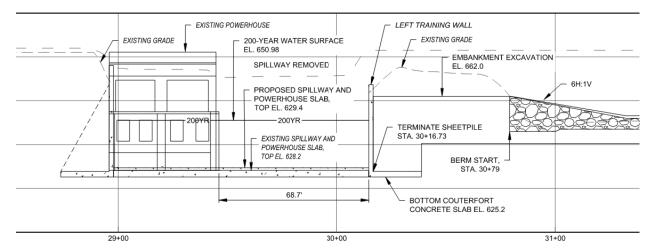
Phase I Interim Stabilization Alternative IV Elevation View
